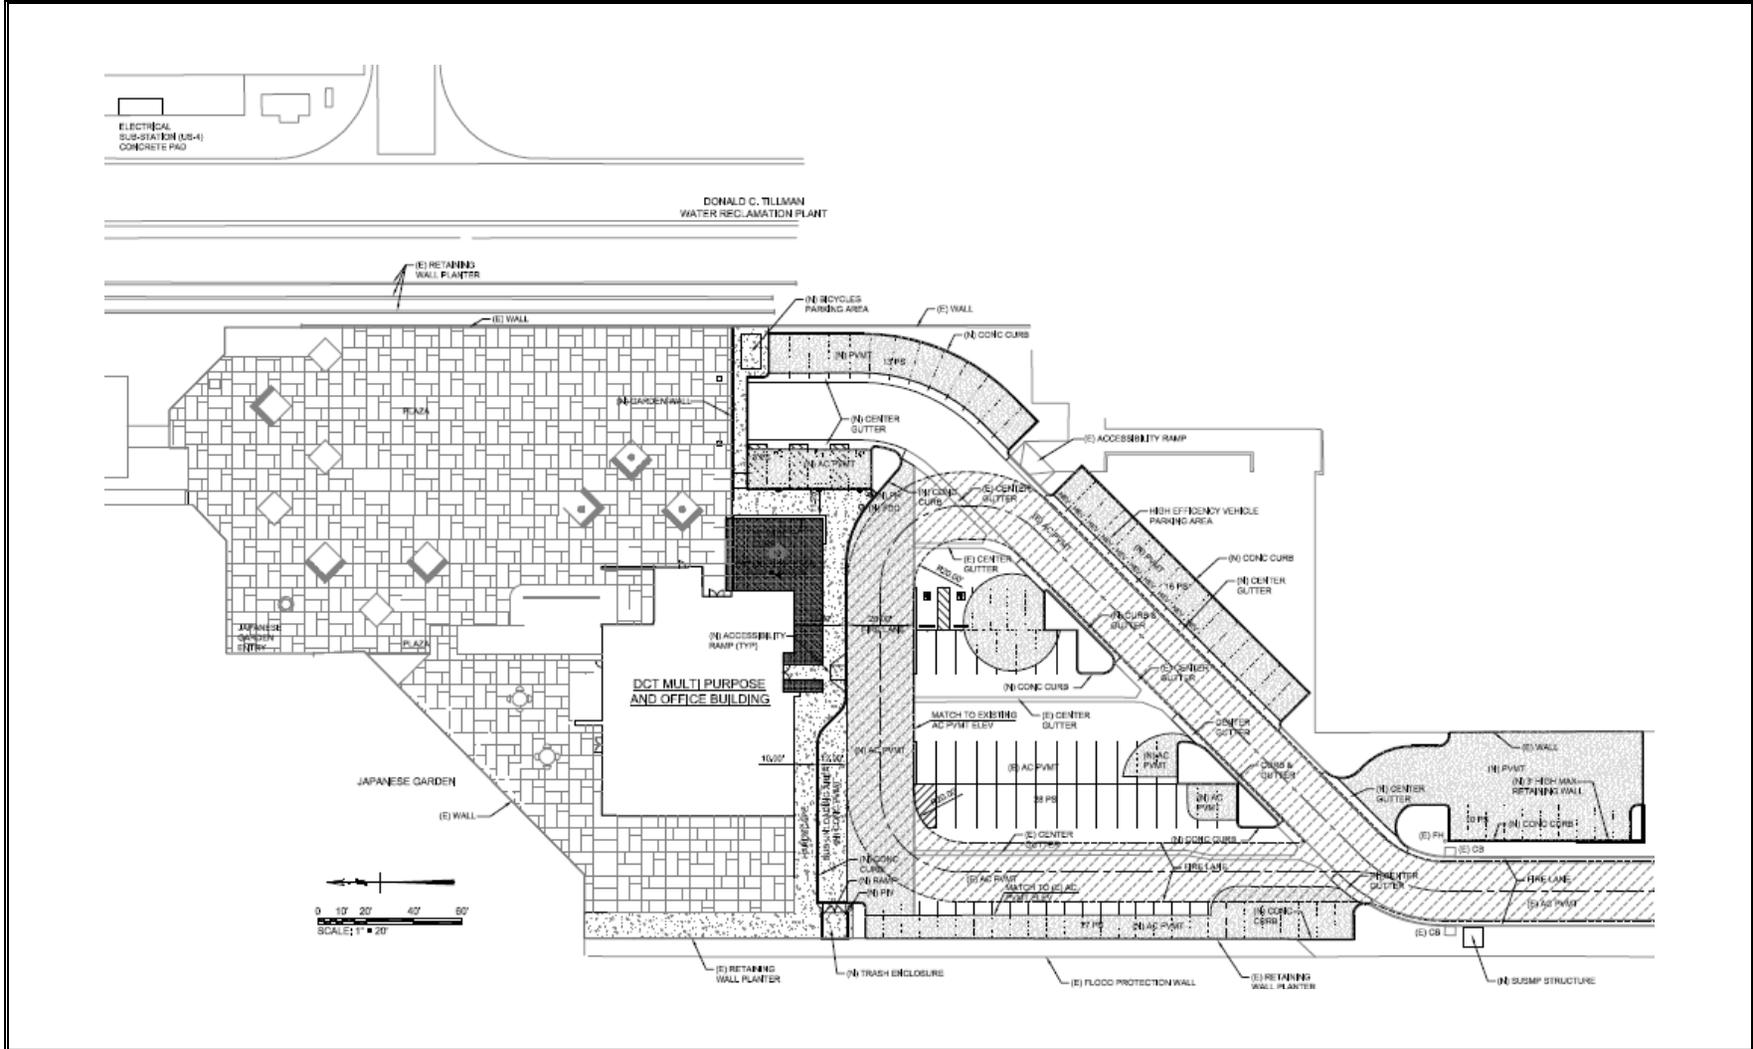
Reduced-Size Facility Alternative Concept Plan
